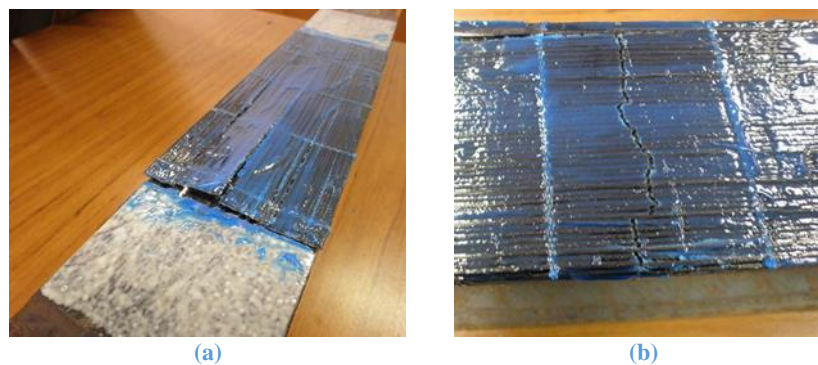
Failure modes of beams in bending (a) Debonding failure (Specimen B1) (b) Fibre breakage failure (Specimen B2)
